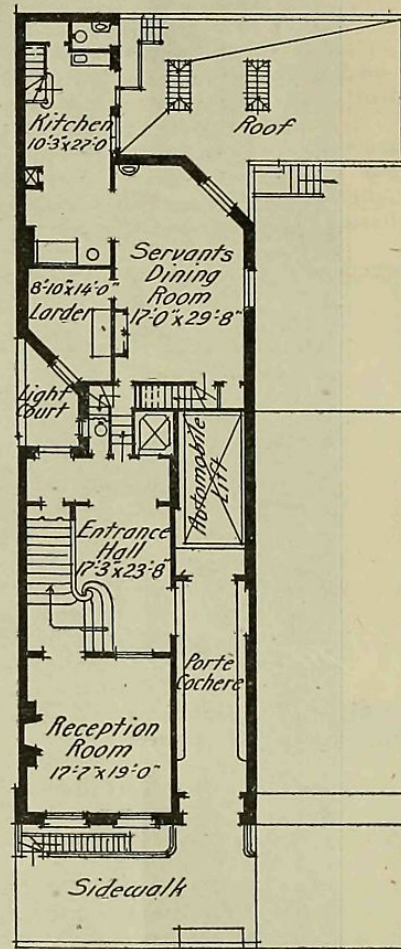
GROUND FLOOR PLAN.—ERNEST FLAGG'S HOUSE.
